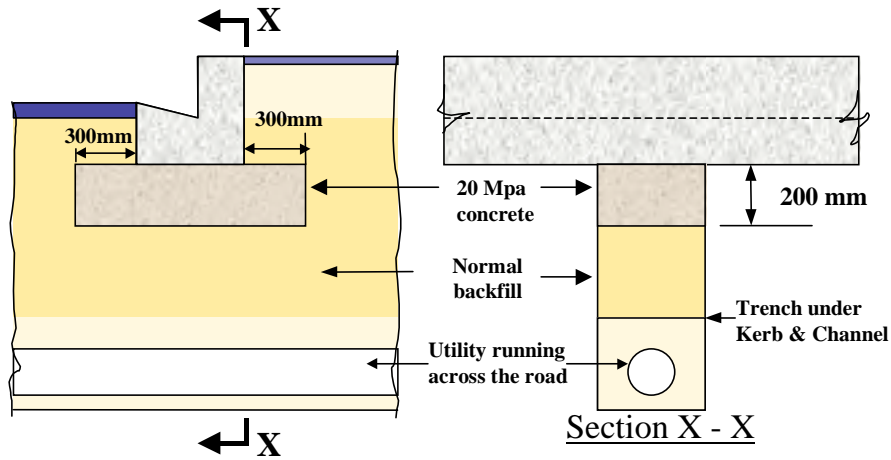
Concrete and backfill foundation under a concrete water channel or kerb
